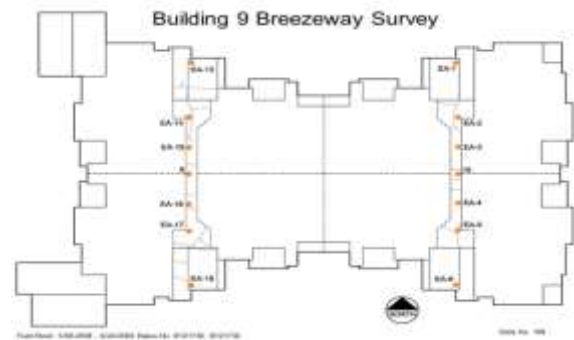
Typical Building Footprint With Survey Locations of Survey Points in Breezeways
